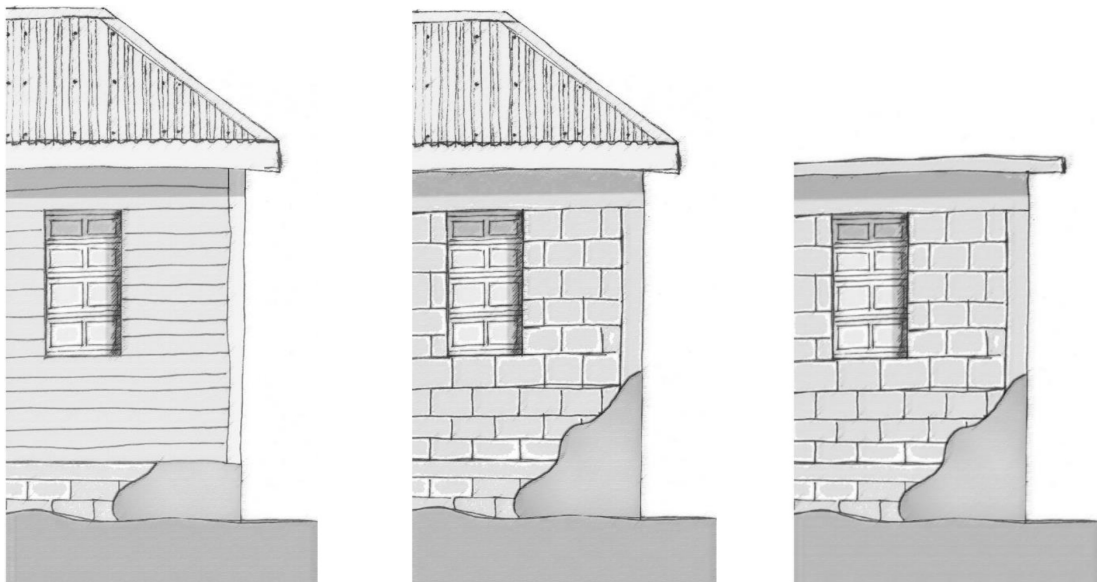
Sketch of the three domestic vernacular types, from left to right; 1. concrete foundation, wood walls, wood roof; 2. concrete foundation, concrete walls, wood roof; 3. concrete foundation, concrete walls, concrete flat roof (own illustrations).
